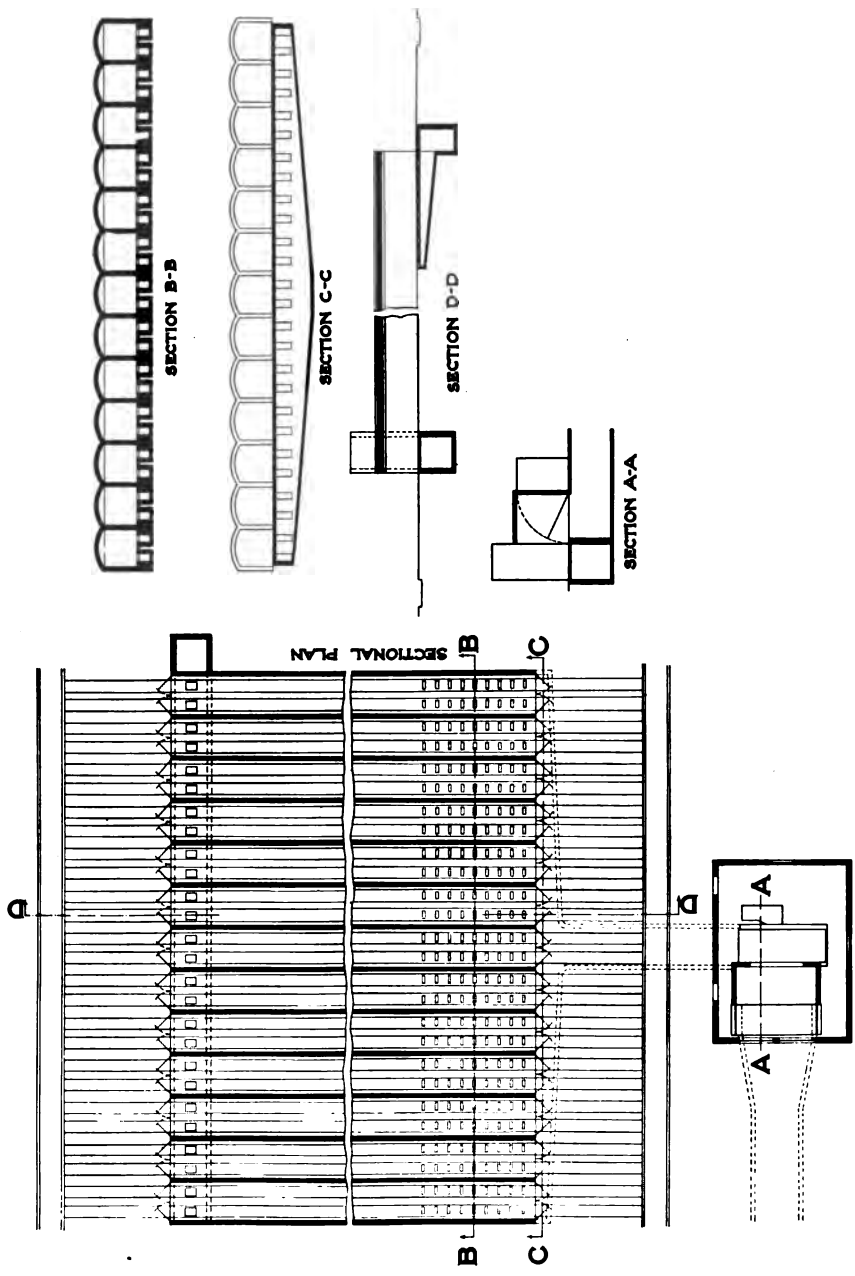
Waste Heat Tunnel Dryer. Ludowici-Celadon Co., New Lexington, Ohio.
